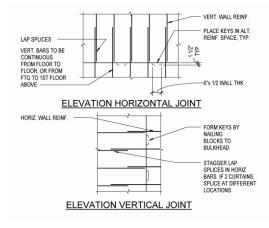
| Horizontal and Vertical Wall Joints (Detail 9-S304)
